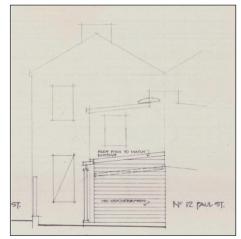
Southern elevation. J. Greenwood (1984). Inner West Council Archives
